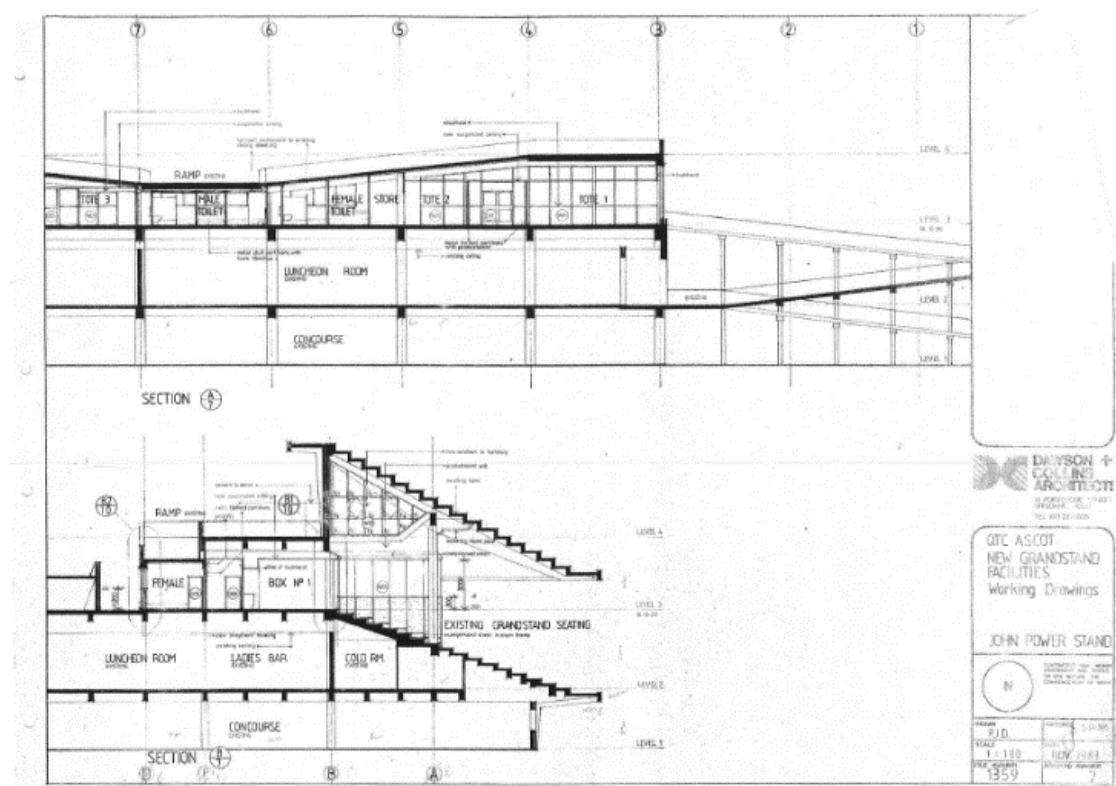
A section drawing from 1983 that shows the works to the upper floors of the building for the private boxes and toilets and extensions to the Ascot Bar
